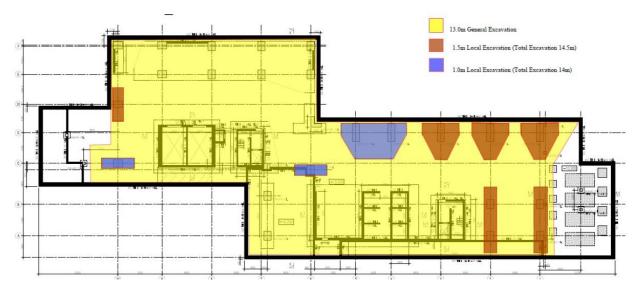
Project Excavation Depths, Source: Method Statement for Shoring & Dewatering
